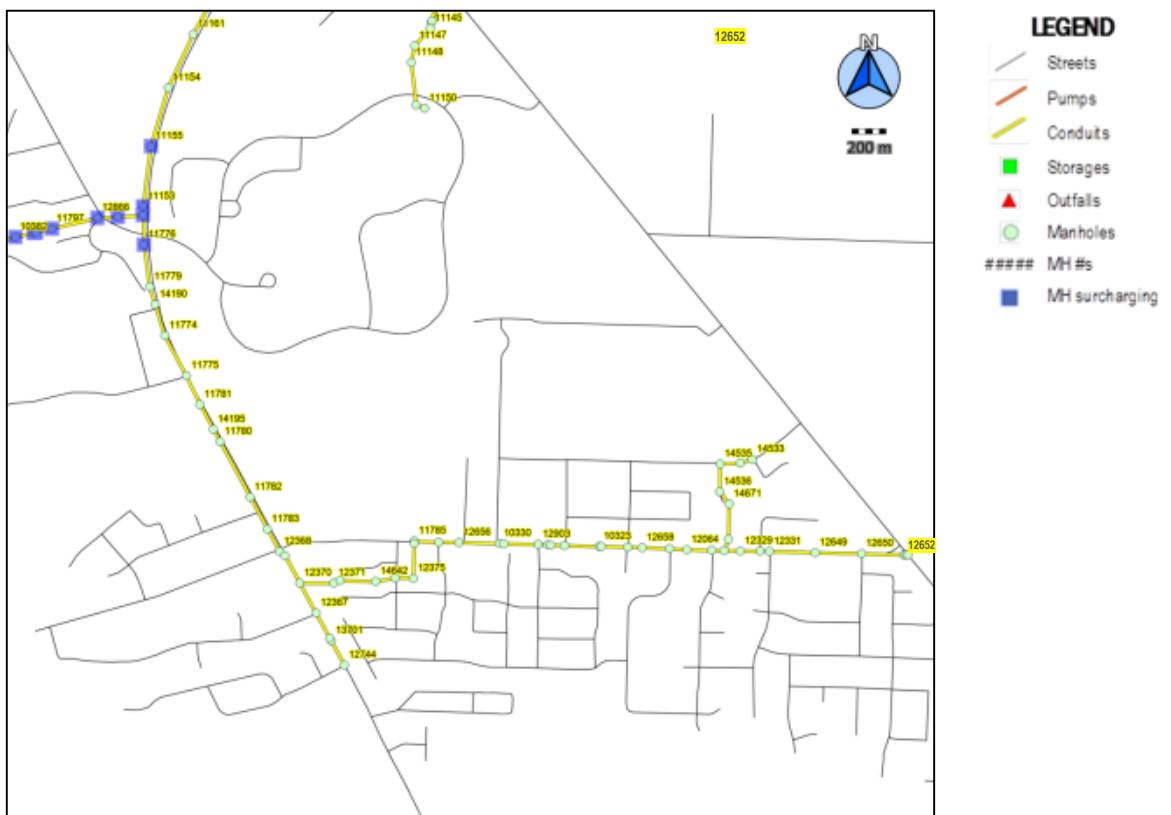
Surcharging Along Glen Oak Road – Alternative A
